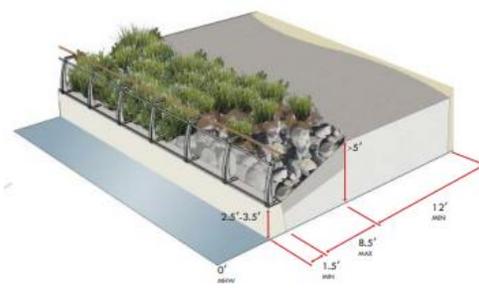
LOW WALL WITH RIPAP AND RAILING
